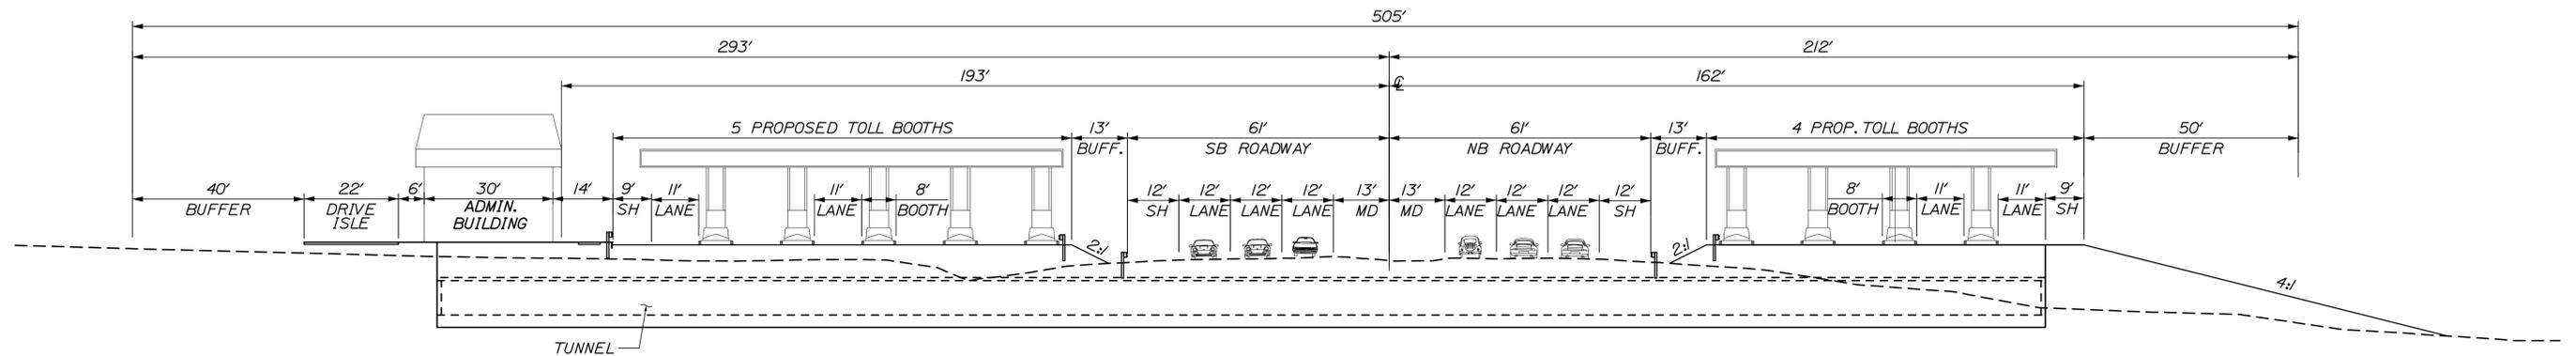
ALTERNATIVE 1 - PLAN
